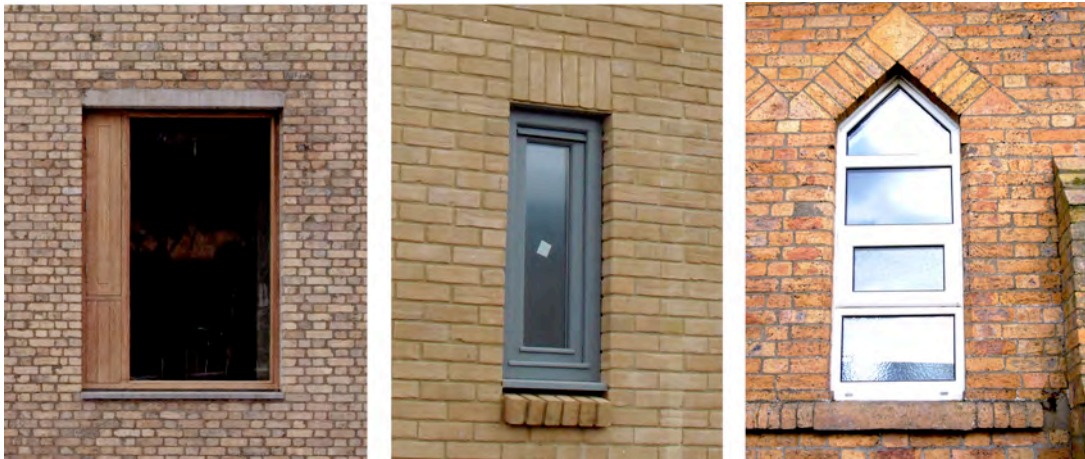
Window head details: Ranelagh School by O'Donnell & Tuomey, as built, the original church
